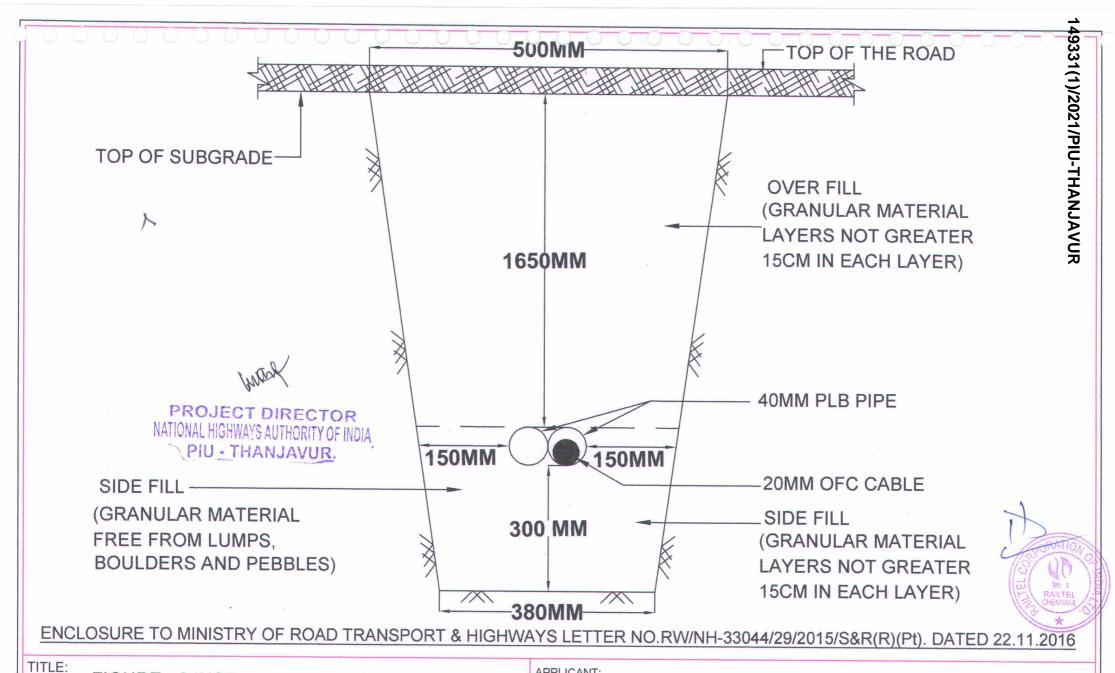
INSTALLATION OF PIPE FOR ALONG THE ROAD (TRENCH METHOD) & PLACE WHERE THE DISTANCE FROM THE CARRIAGE
